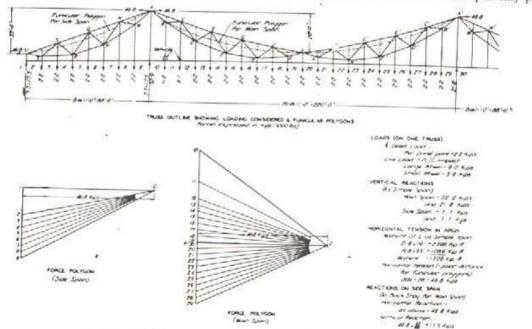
Truss Outline and Construction of Typical Funicular Polygons.
